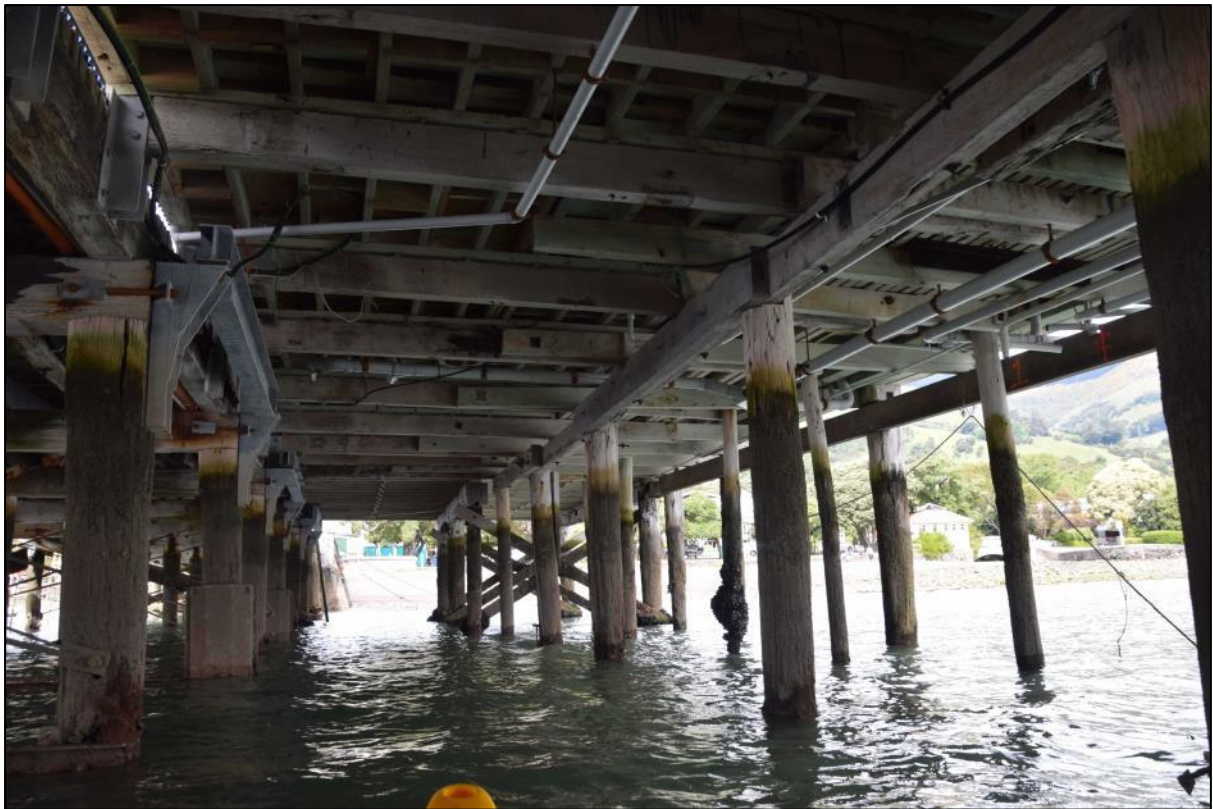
Modern piles, pile caps and floor framing beneath the eastern end of the sheds.
